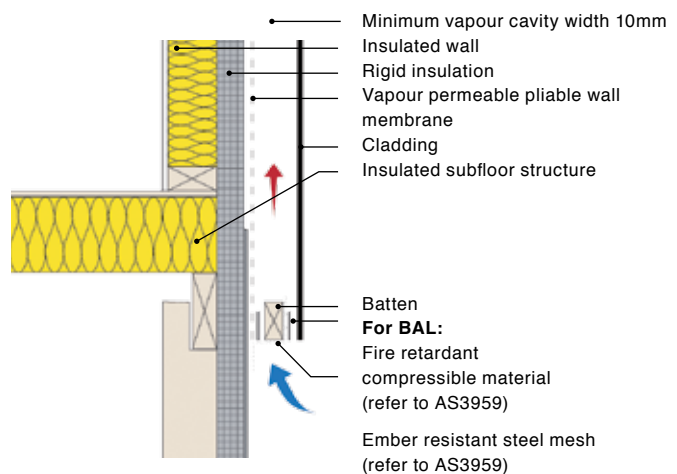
Suspended timber floor horizontal battens and rigid insulation
